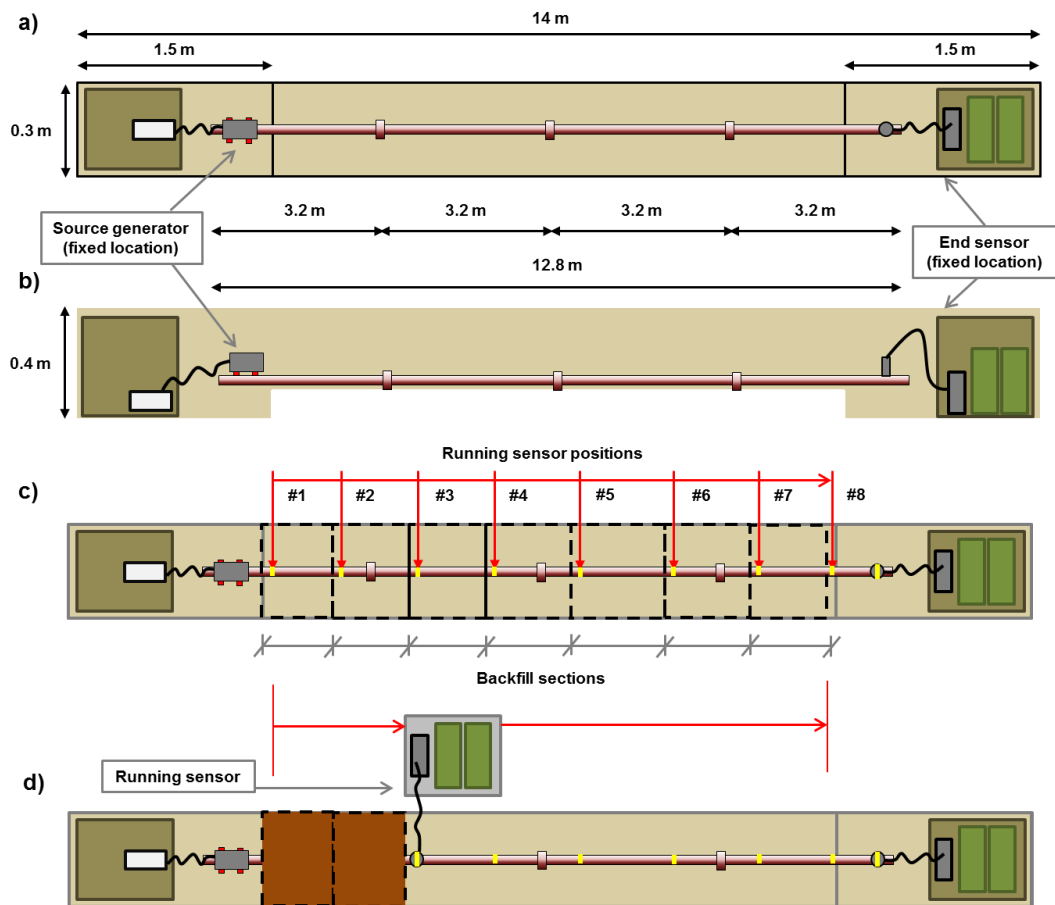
Schematic of trench experiment, a) plan and dimensions, b) elevation and dimensions, c) running sensor positions and backfill sections, d) running sensor at position 3 with 2 sections backfilled
